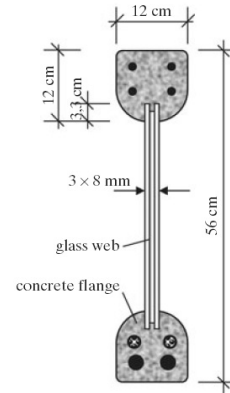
Glass-Reinforced Concrete beam (section), proposed by Freytag.
